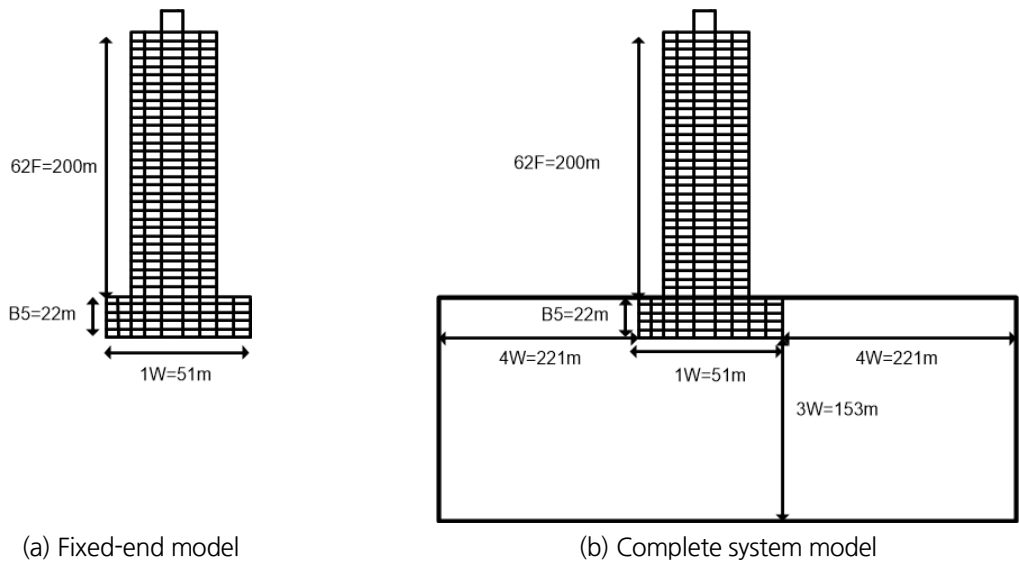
The analysis section of 62 floor high-rise building with 5 underground stories
